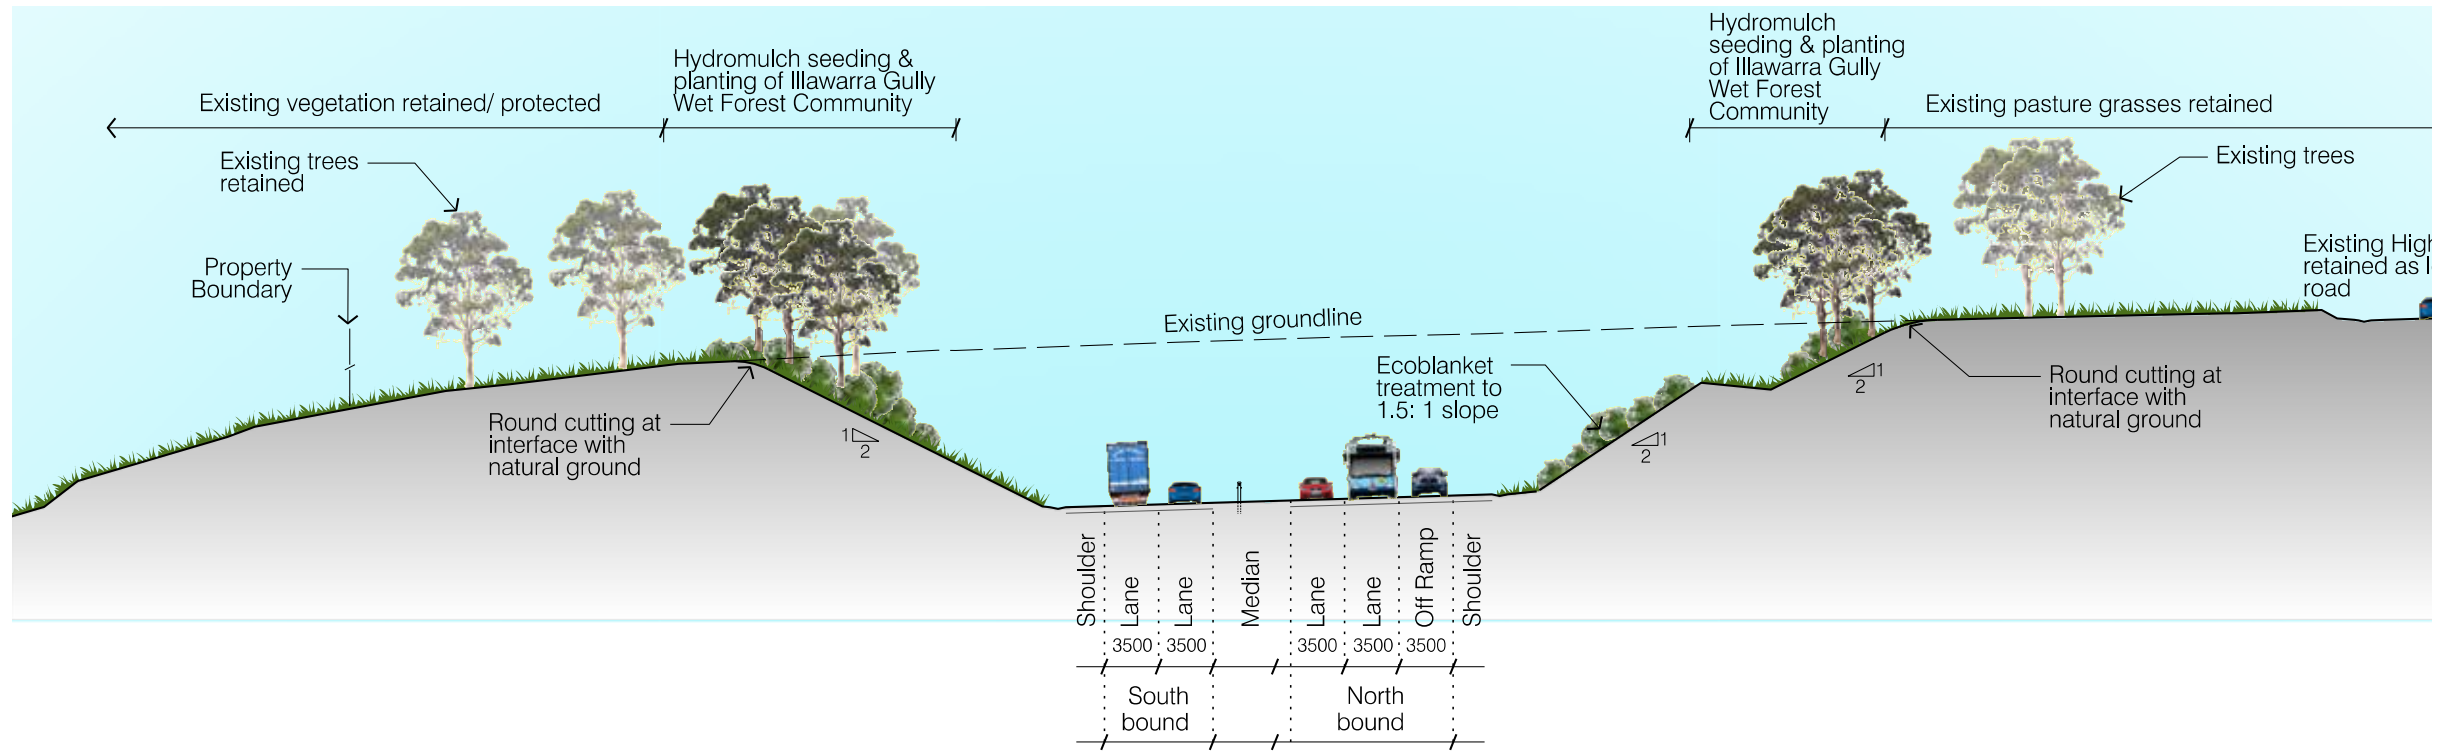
Road cross section at Ch. 14000 (Scale 1:500 @ A3)
